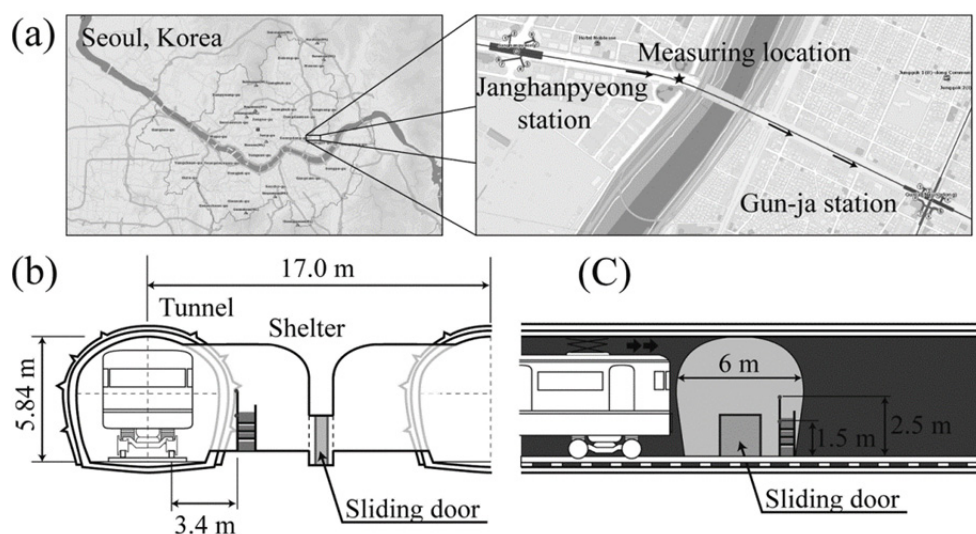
Measurement site information: (a) location of the measurement site, (b) cross-sectional view of the tunnel at measurement site, and (c) side view of tunnel at measurement site.
